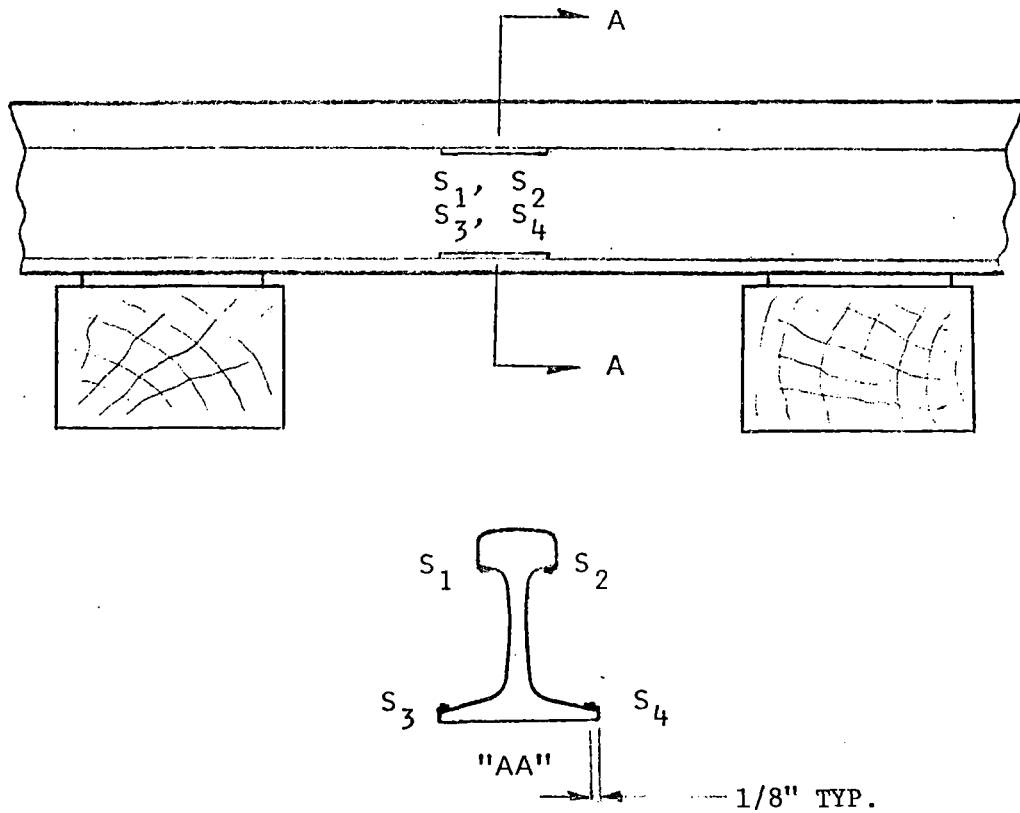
LOCATION OF LONGITUDINAL STRAIN GAGES ON RAIL, SITE 6, TEST SECTIONS 1 AND 2
